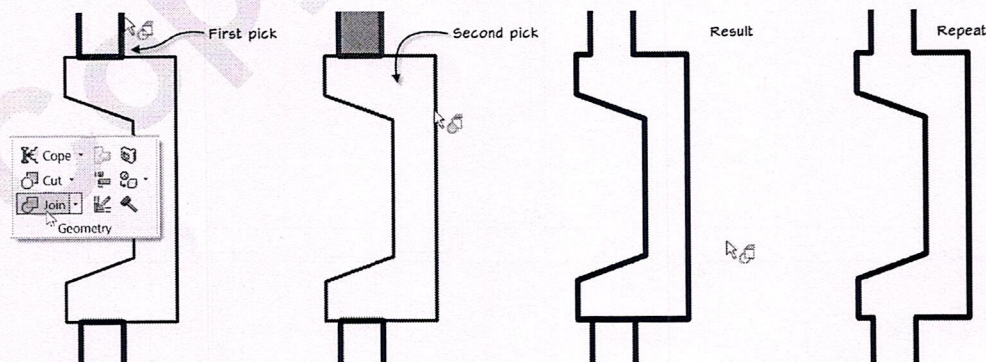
Use Join Geometry to join the walls to the Fireplace
